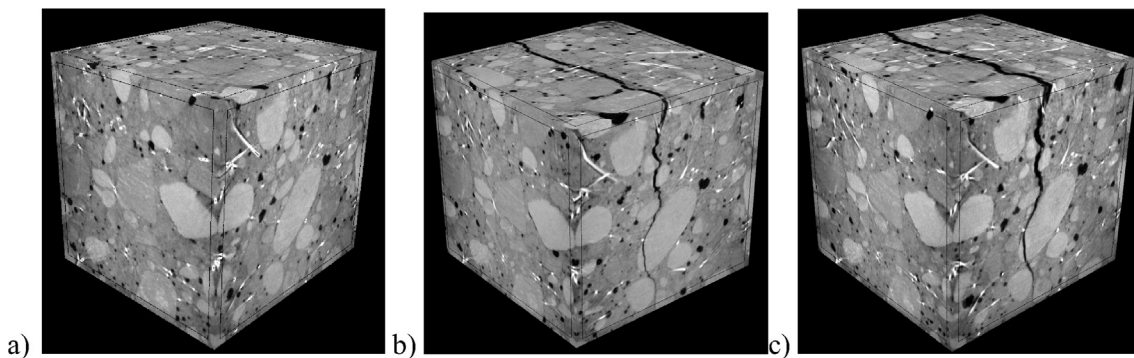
General view on concrete reinforced with ISF cubic specimens from images by 3D micro-CT: a) non-cracked, before test, b) cracked, at CMOD = 1.5 mm c) cracked, at CMOD = 2.5 mm.
